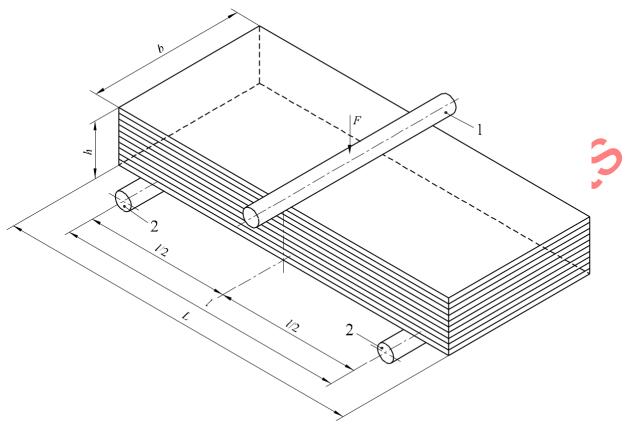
Arrangement of loading of test specimen (centre point loading)
